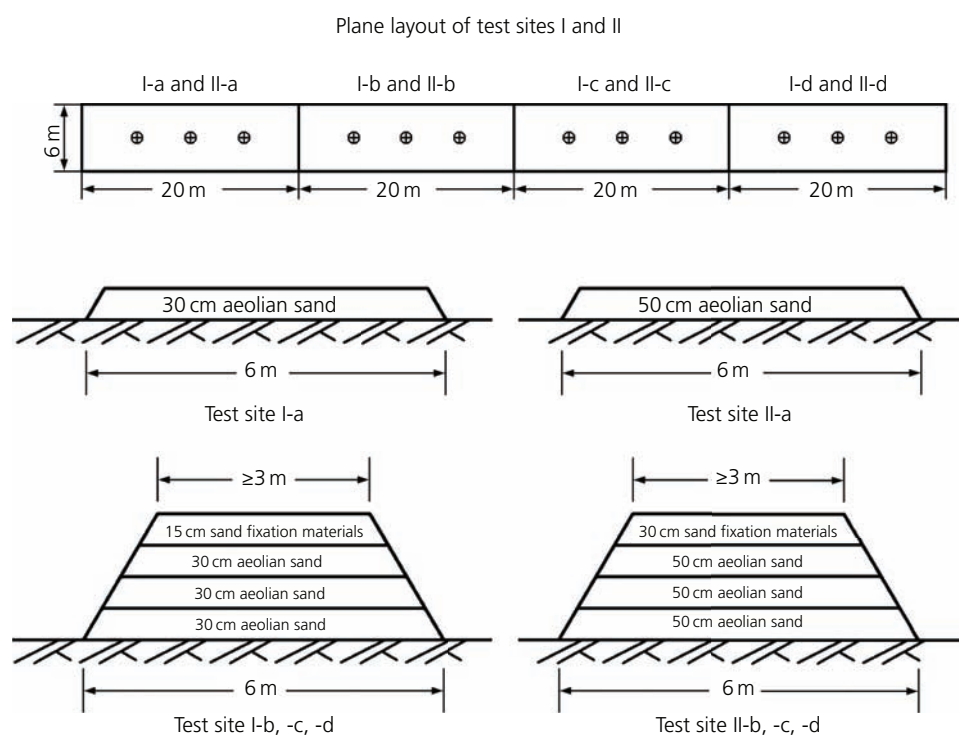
Plane layout and profile layouts of the two sites used for backfill rolling tests. Note: (a) the thickness of the backfill is loose laying depth; (b) ⊕ is the top elevation measurement spot
